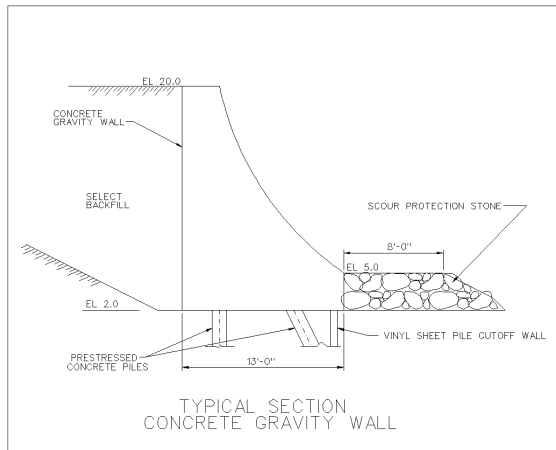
Downtown Bay St. Louis, Concrete Gravity Seawall Cross-Section
